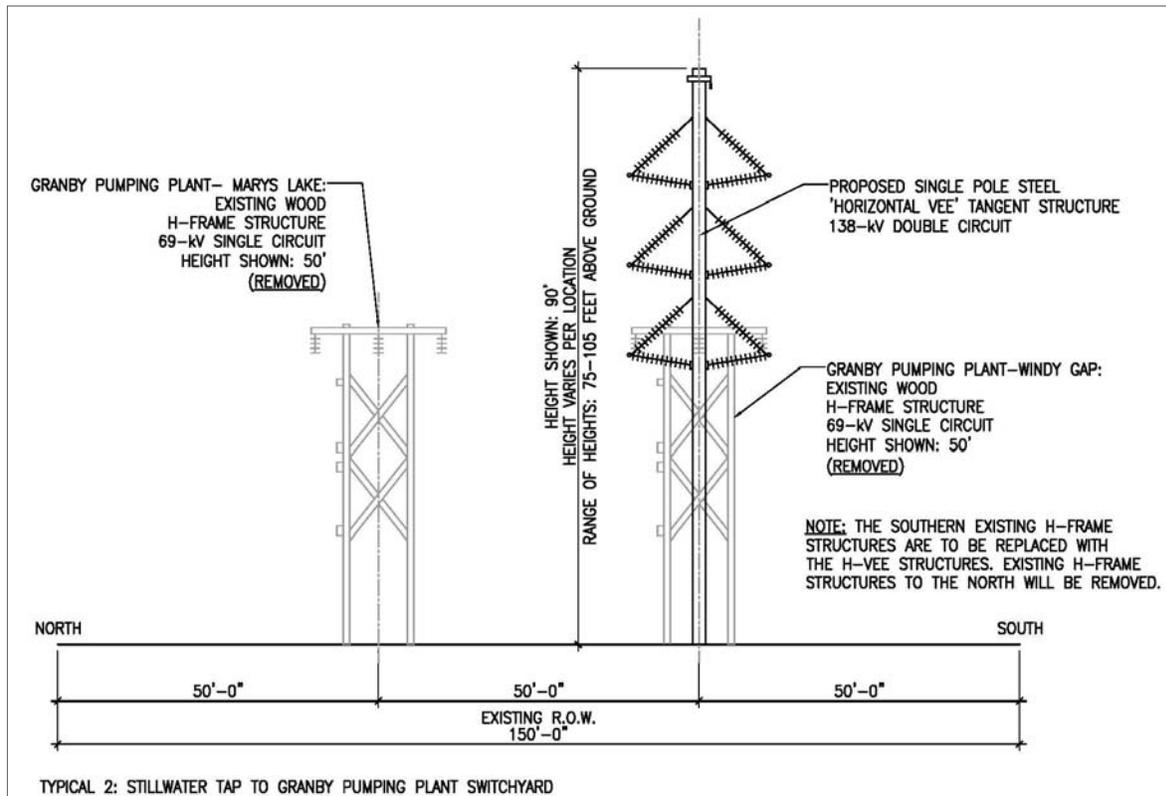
Typical Profile of Existing Parallel ROW Versus New Single ROW Leaving Stillwater Tap towards Granby Pumping Plant Switchyard.
